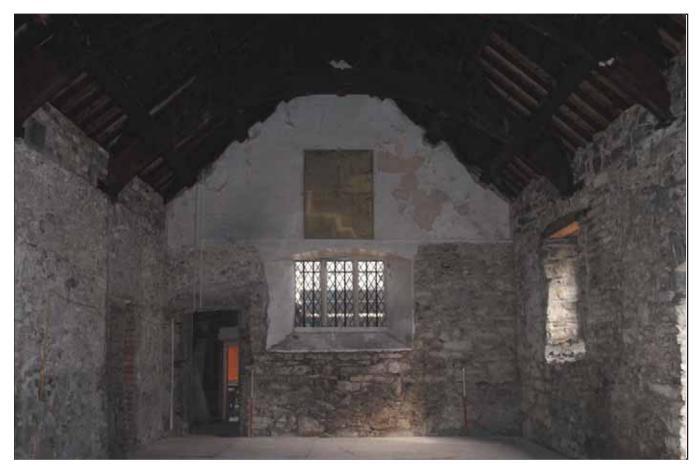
Old Grammar School internal - North Facing Internal elevation of the School Hall. Scales 1m
